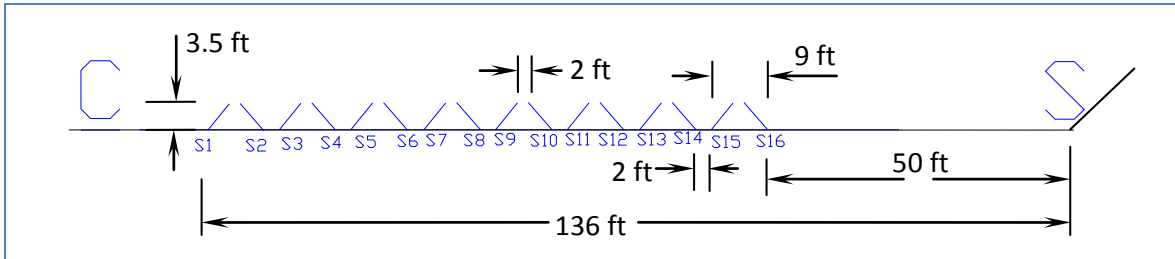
Layout of sensor section at Site I, Nolo Mine.
